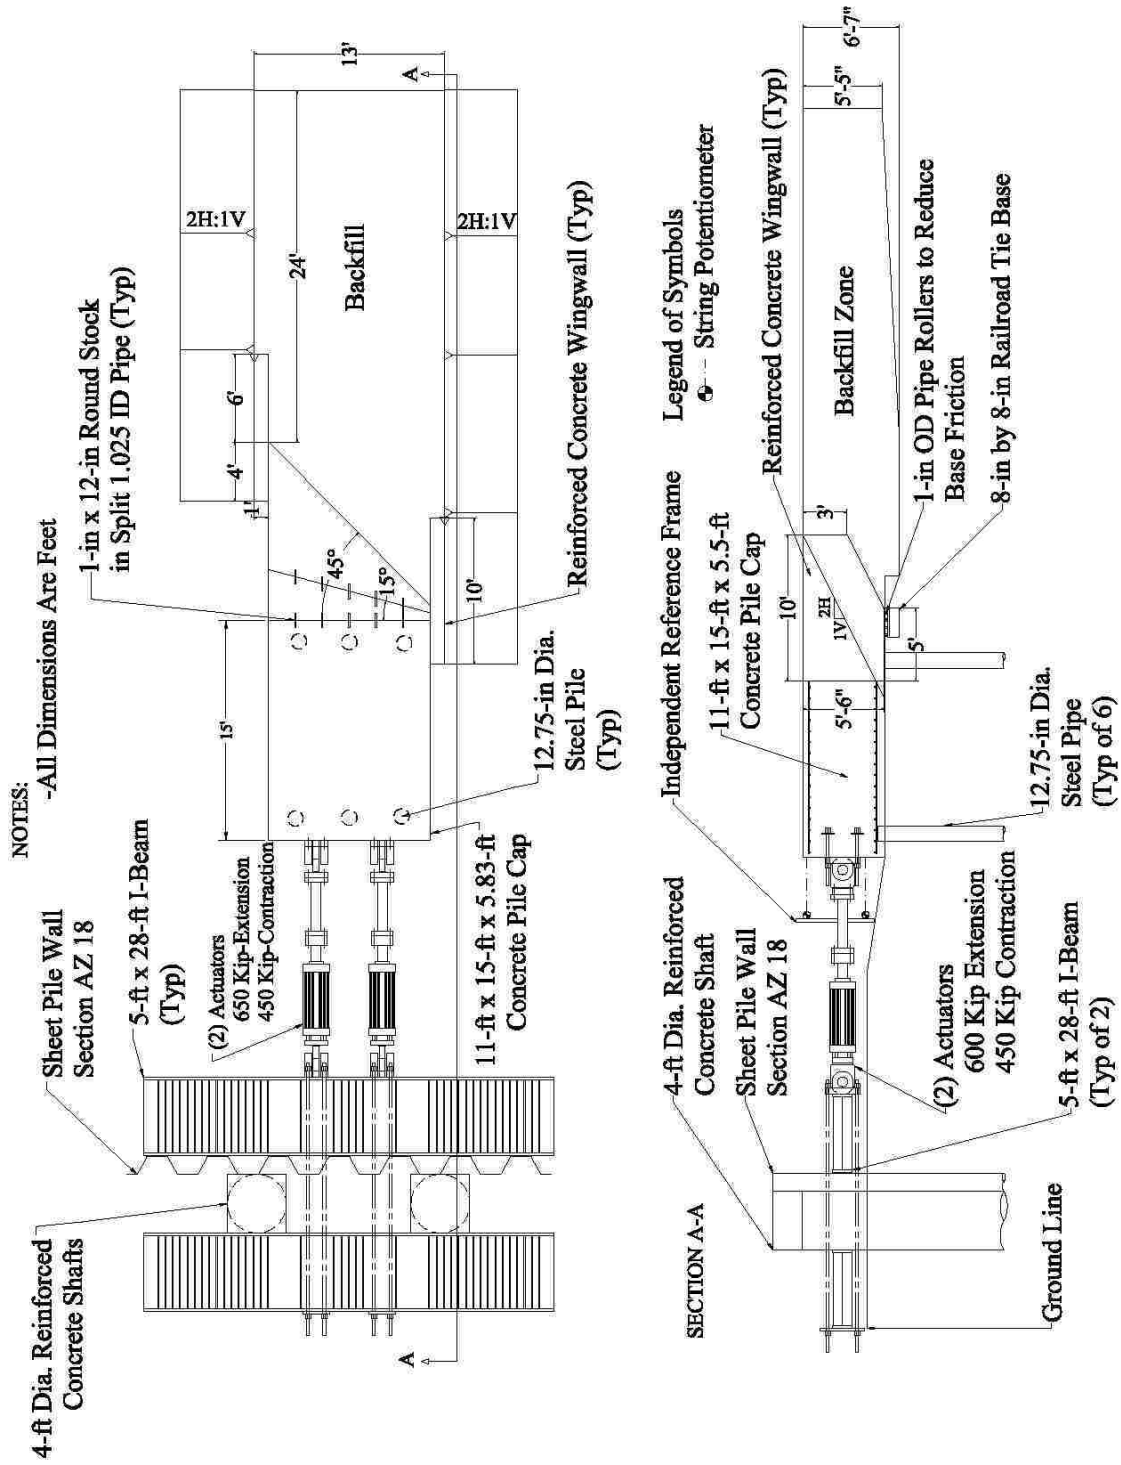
Schematic drawing of test layout for abutment with reinforced concrete wingwalls.
